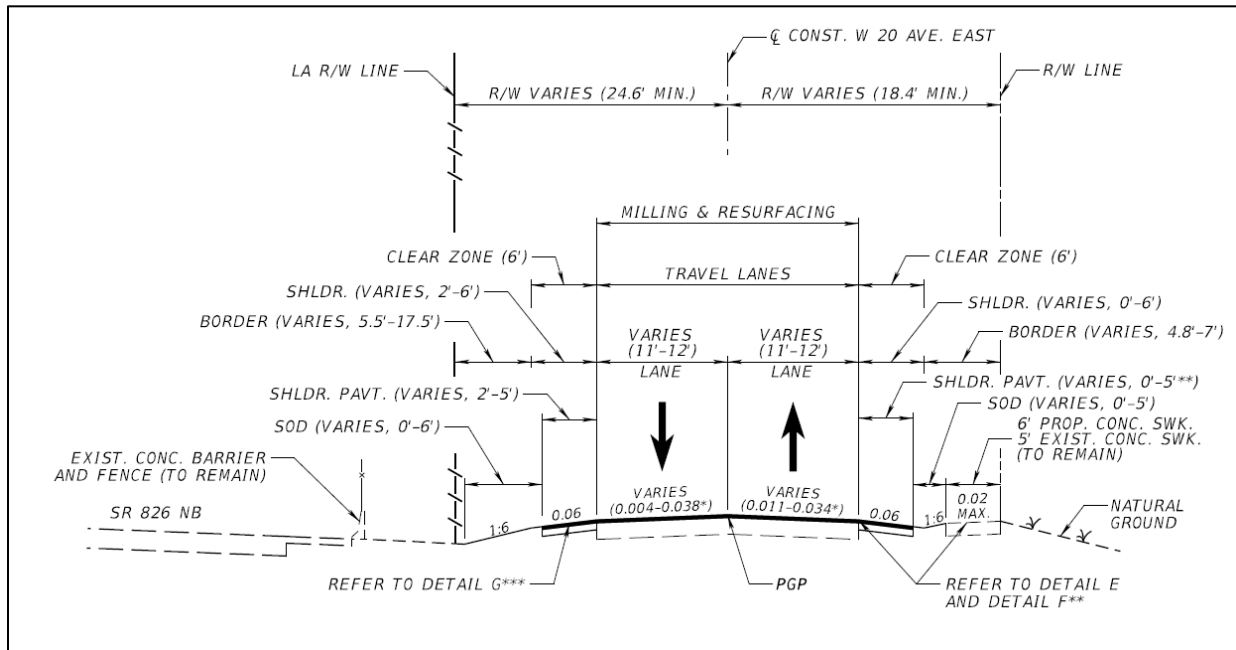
Proposed Frontage Road (Undivided) – Typical Section 8 (East Frontage Road/W 20th Avenue)
